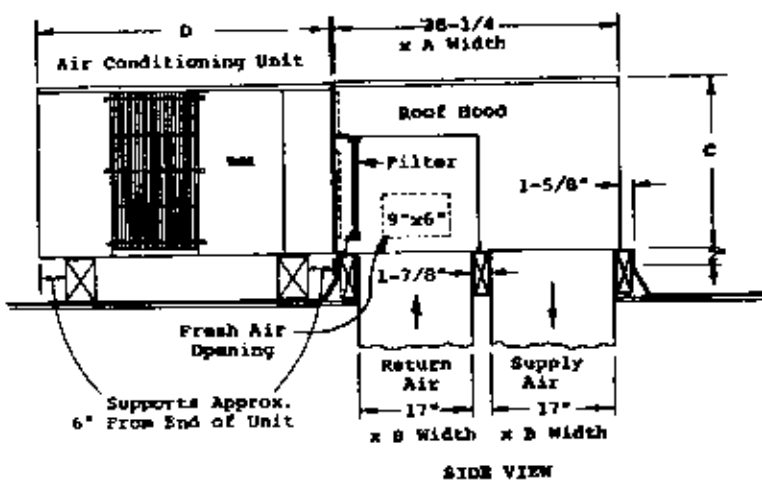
UNIT AND ROOF HOOD DETAILS
